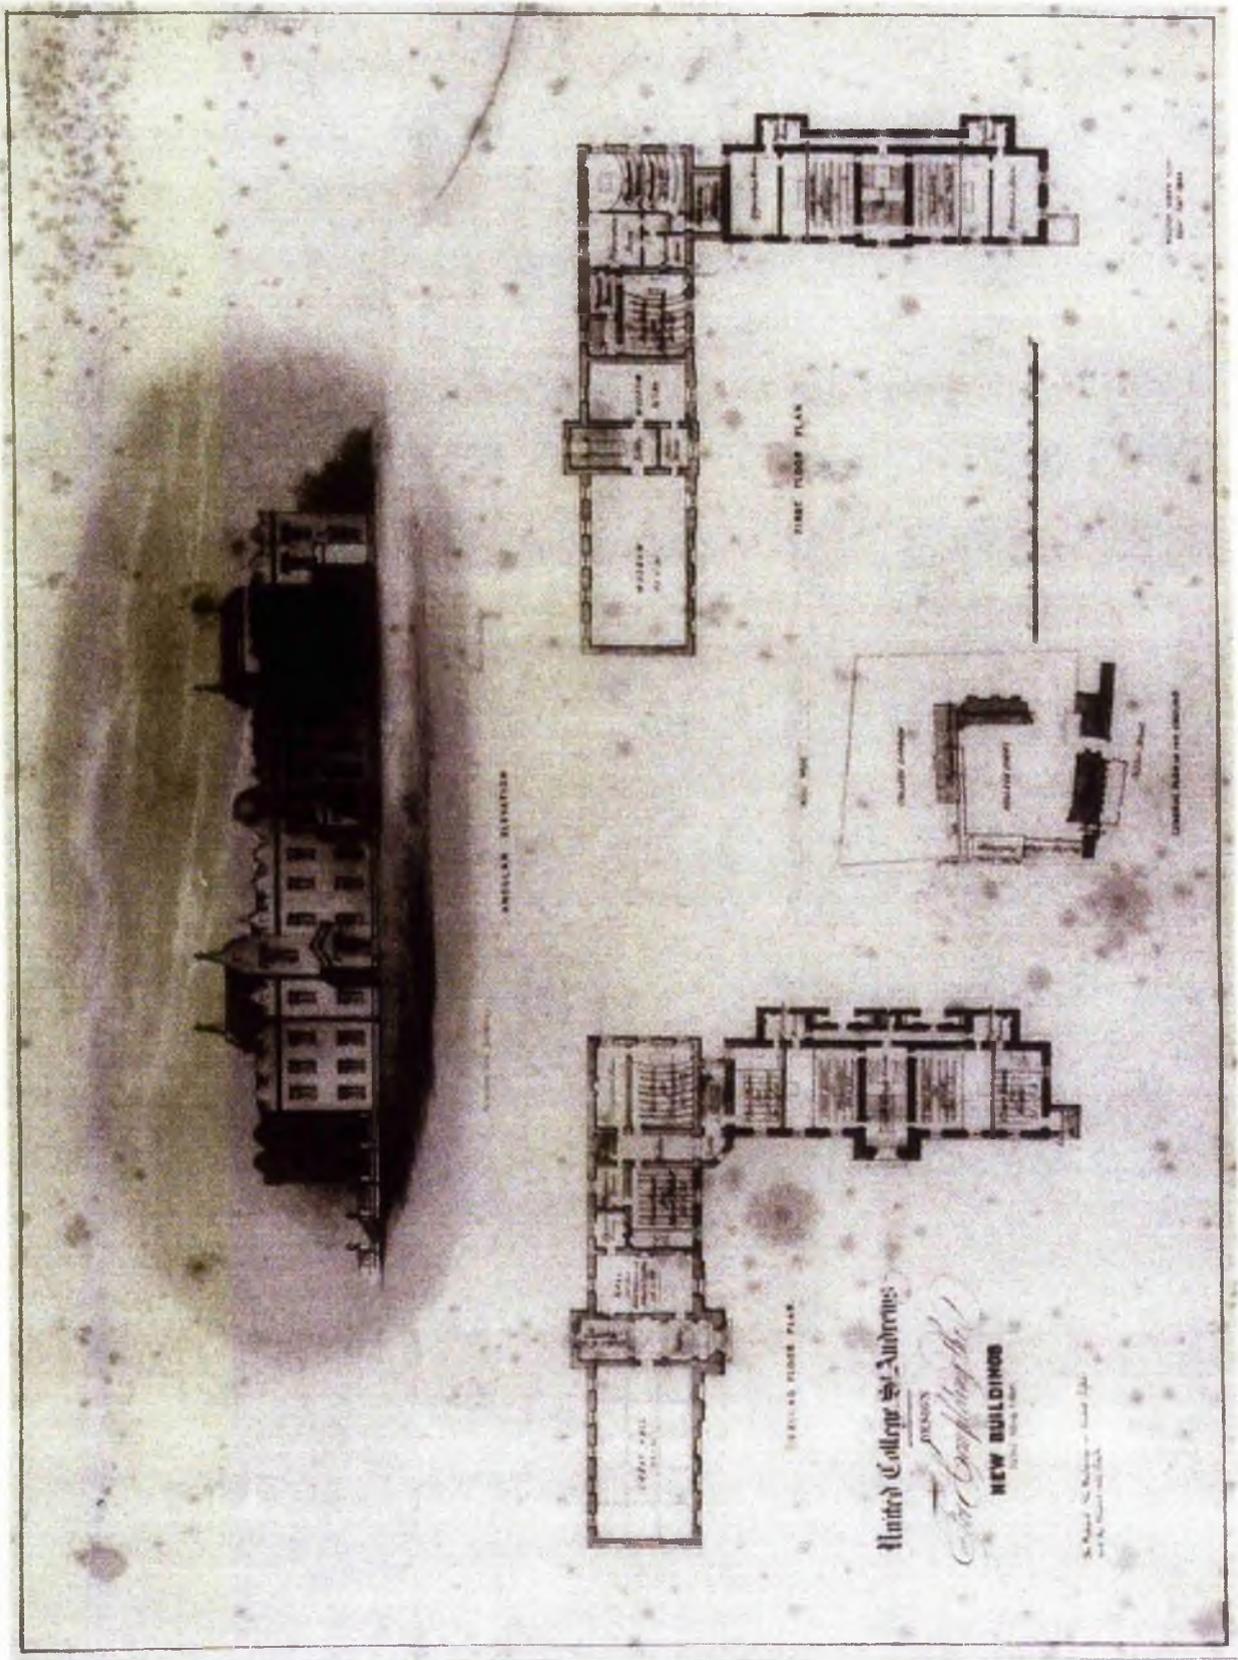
United College. Proposed plans and perspective sketch for the new north wing. W. Nixon February, 1844.
